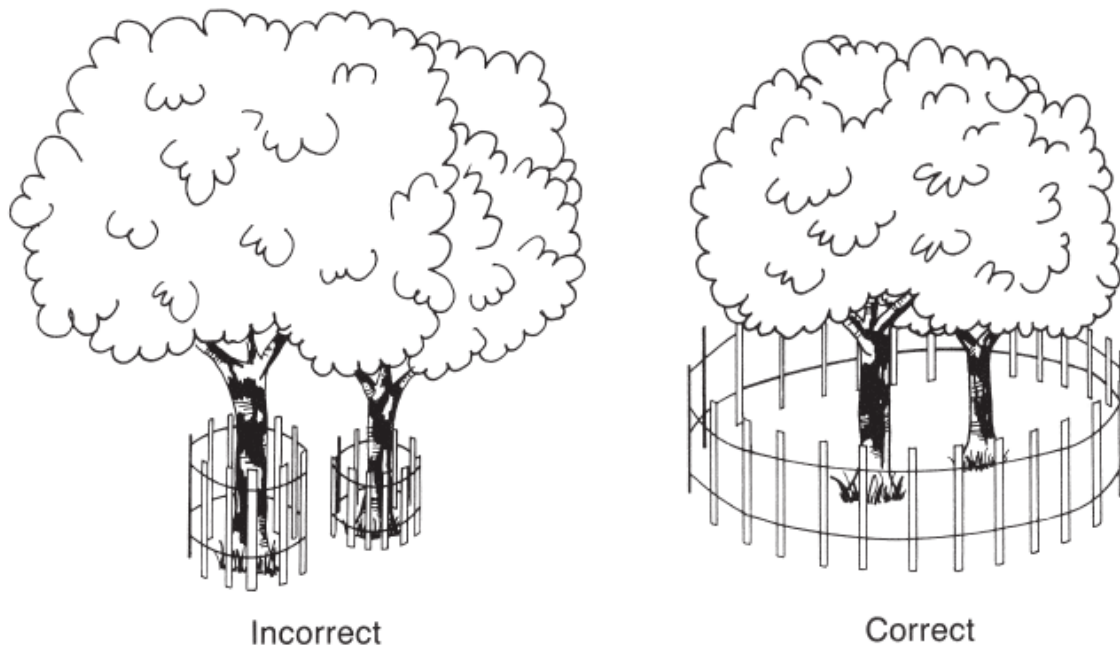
Construction barriers should be installed at the drip line of the tree branches.
